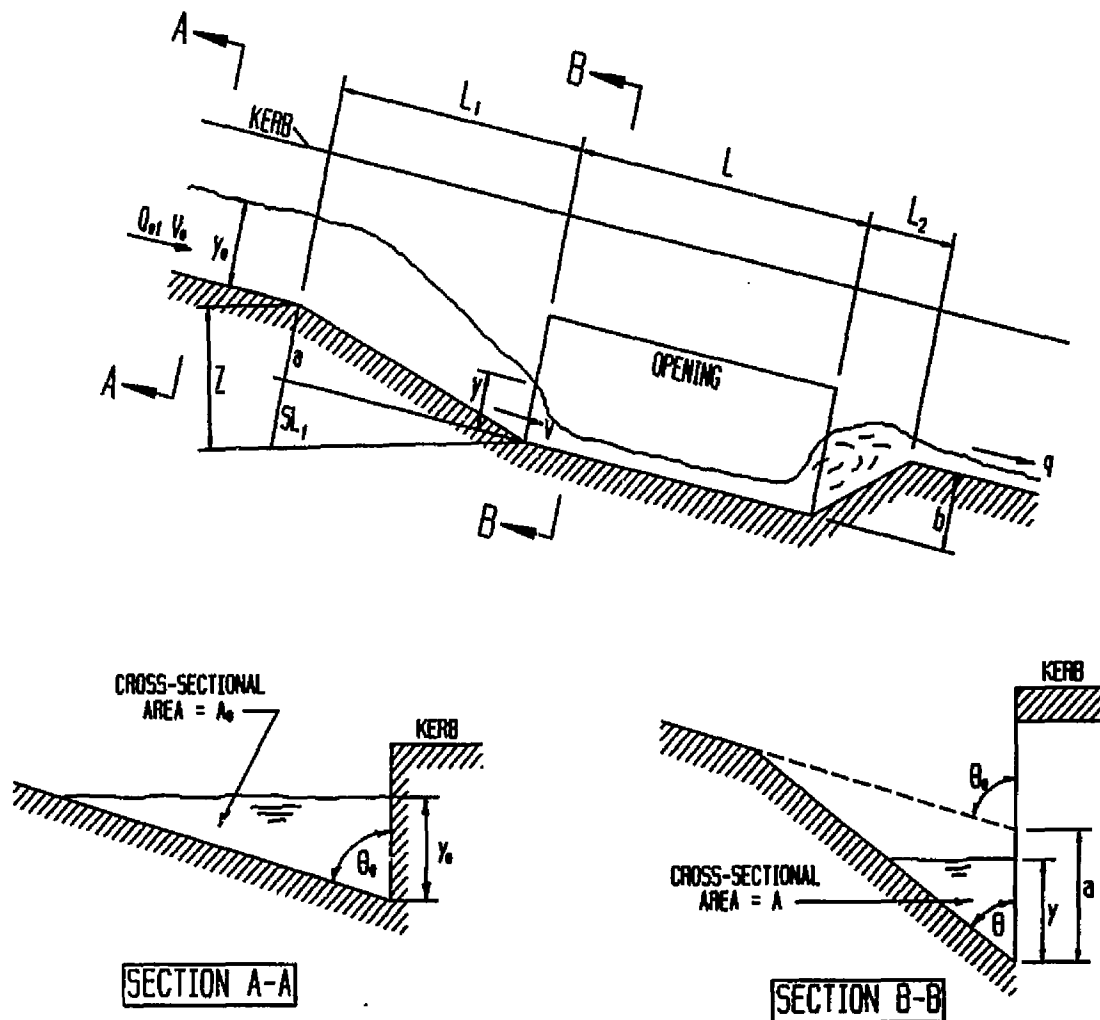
STORMWATER KERB INLET WITH DEPRESSED GUTTER
